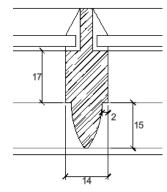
Proposed detail for new windows in original part of dwelling. Histoglass MONO RT+ single glazing, or similar and approved, with special patented insulating hard-coat applied on the room-facing side.
